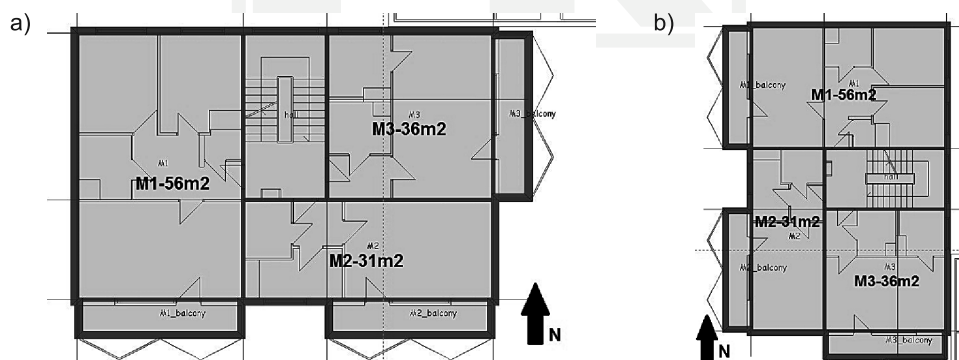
Typical zones' visualization on every building level: a) Two rows of balconies at south elevation, b) Building rotated 90 degrees clockwise – two rows of balconies at west elevation
